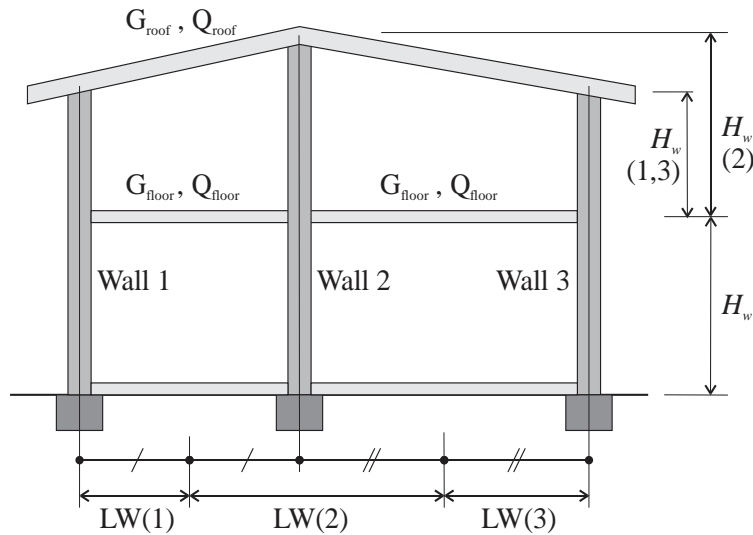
Overall building geometry, Two-storey ($n_s = 2$) double-bay building with internal and external walls, indicating the definition of wall height (H_w) and tributary width (denoted here as LW).
